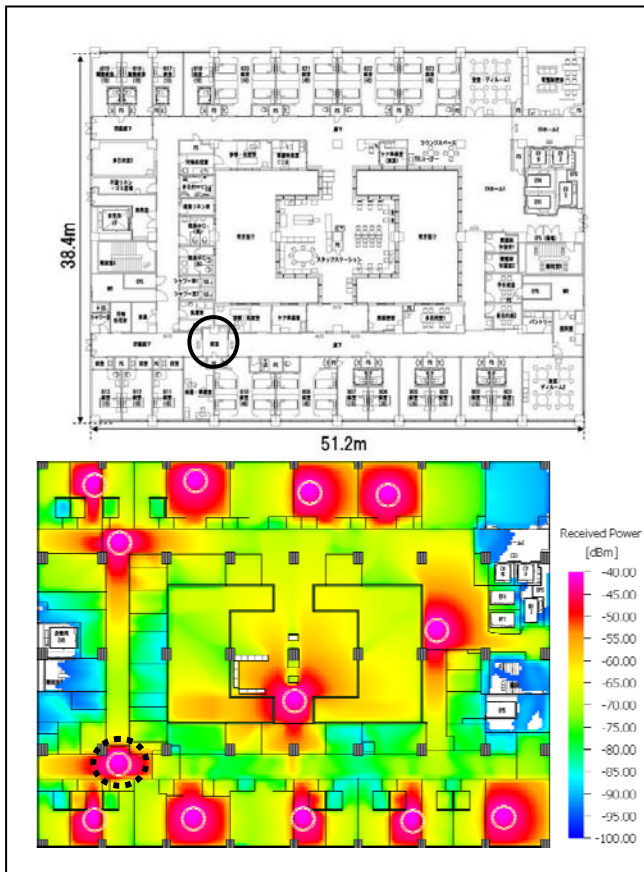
Upper section: Floor plan of the new building (8F, Circle: a door that divides the area)
